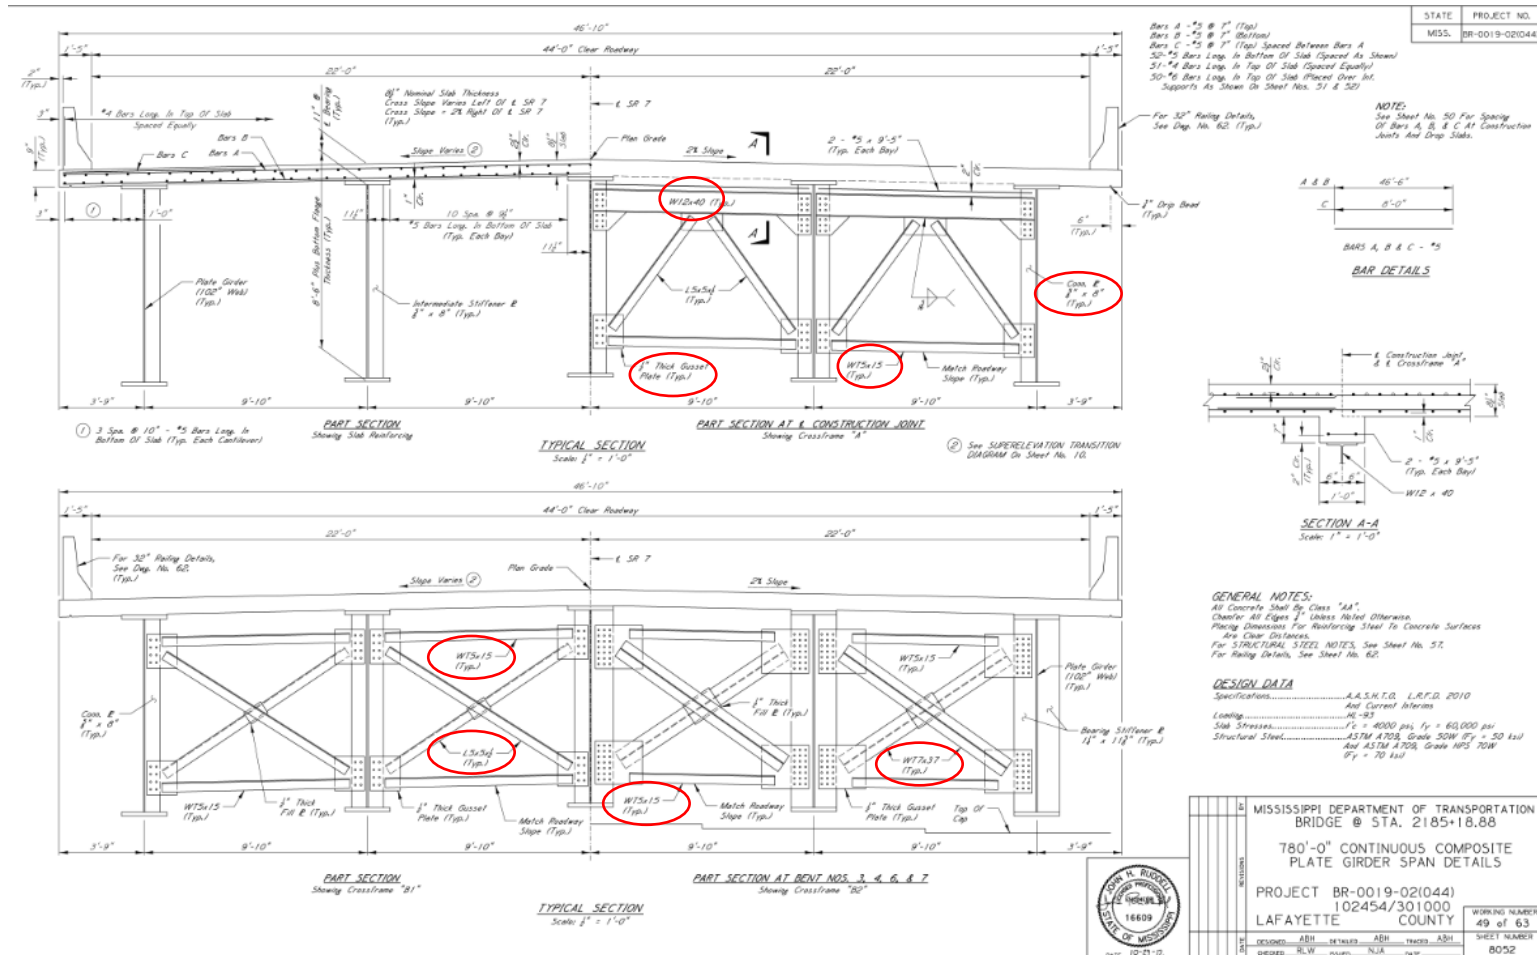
Typical sections of cross frames in the transverse direction of 780 ft girder
